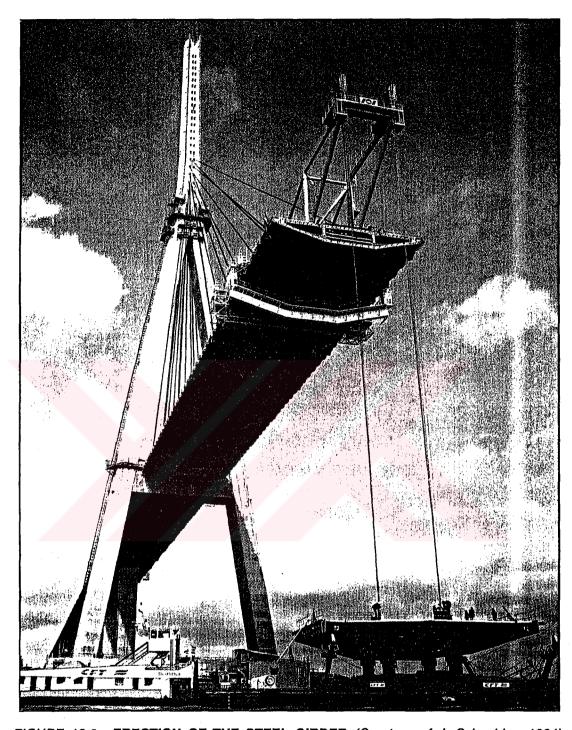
ERECTION OF THE STEEL GIRDER (Courtesy of J. Schneider, 1994)
